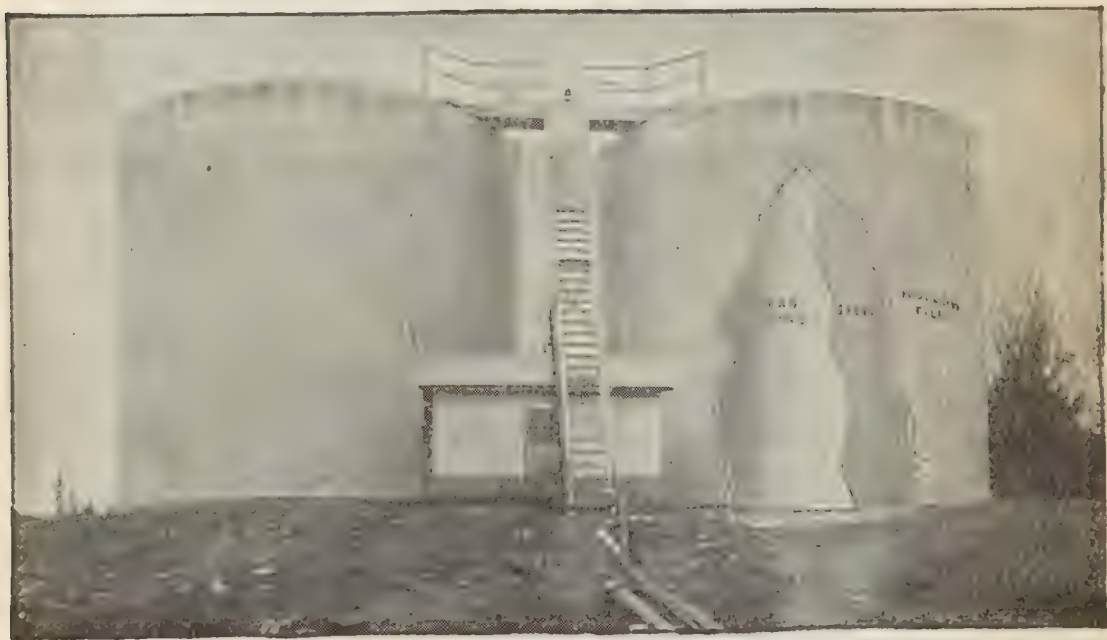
,039.—Lead lined sulphuric acid tanks. Sectional view at right shows method of construction; outer wall of hollow tile, reinforcement riveted steel and inner lining, walls, and bottom sheet lead.
